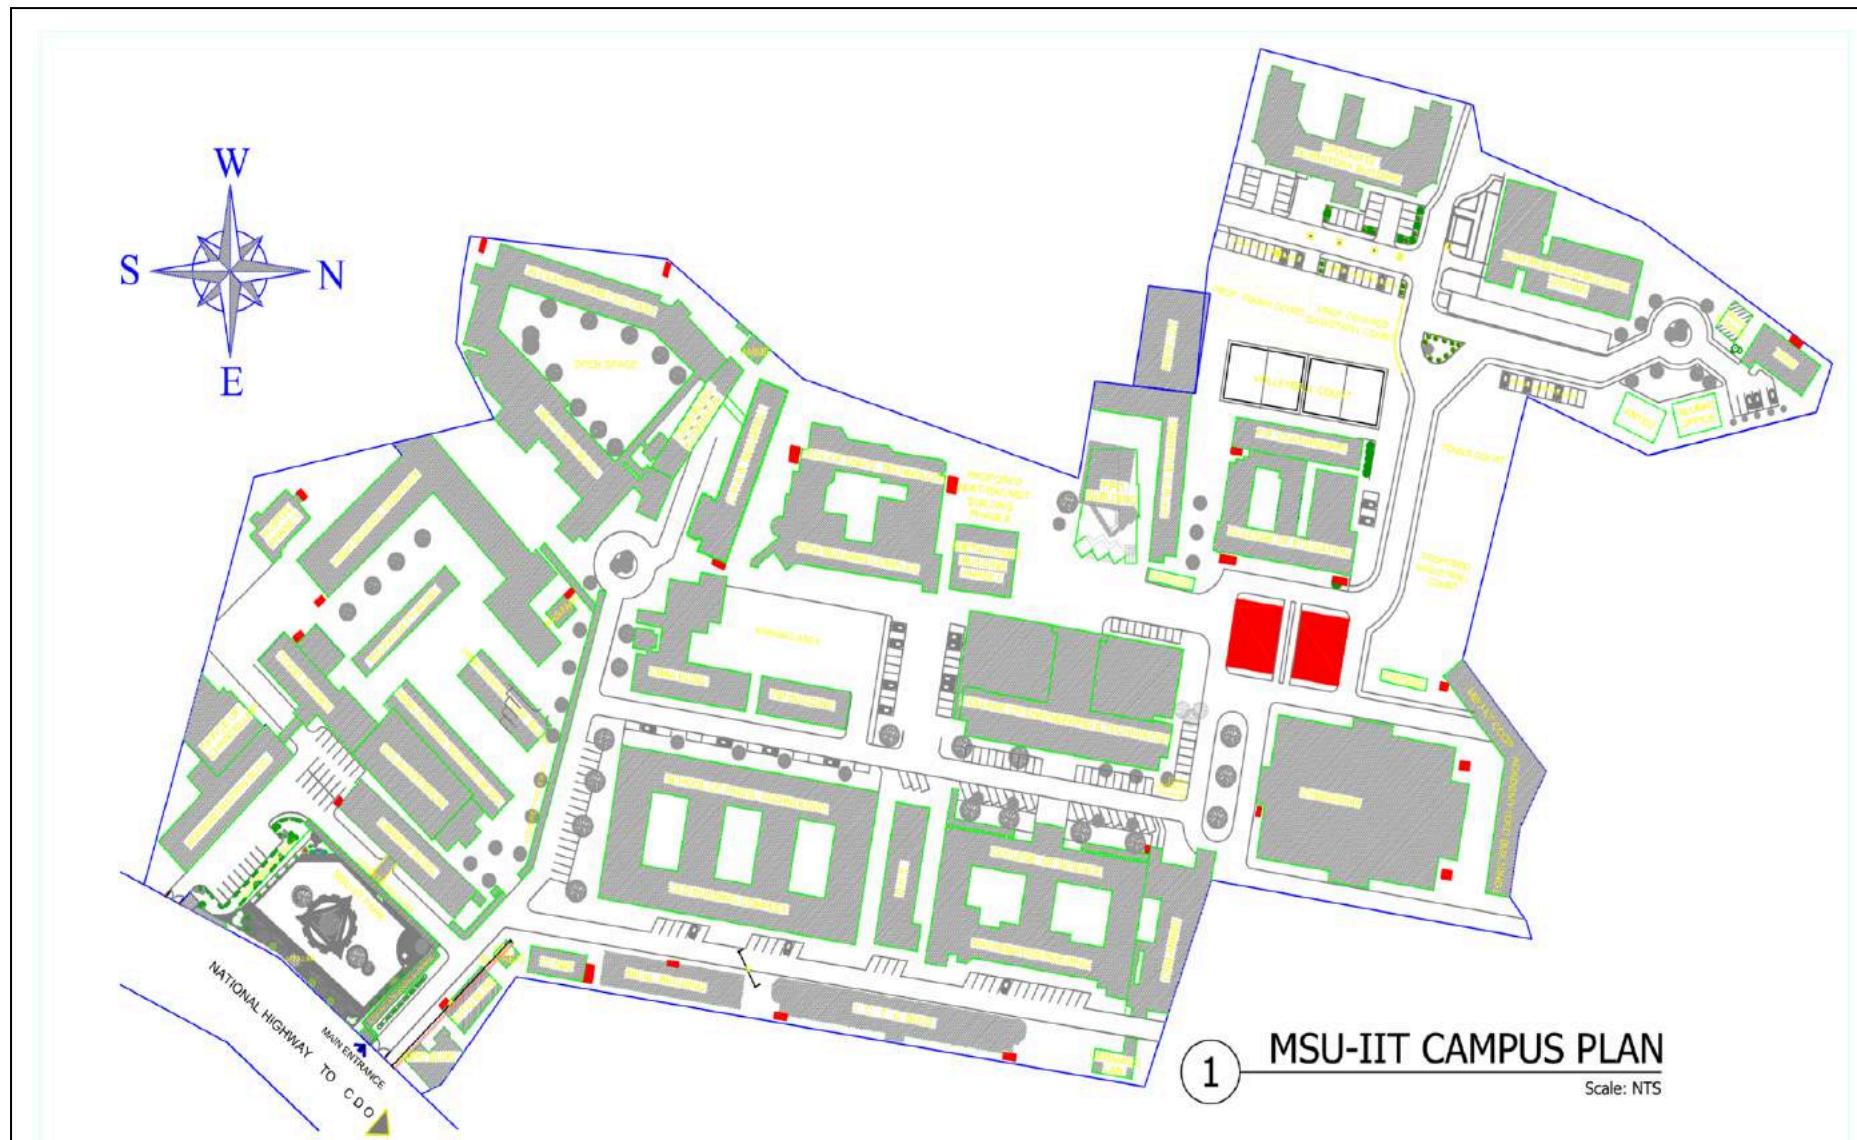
Tibanga Main Campus Existing Sewerage Plan (Albiento et al., 2023)
